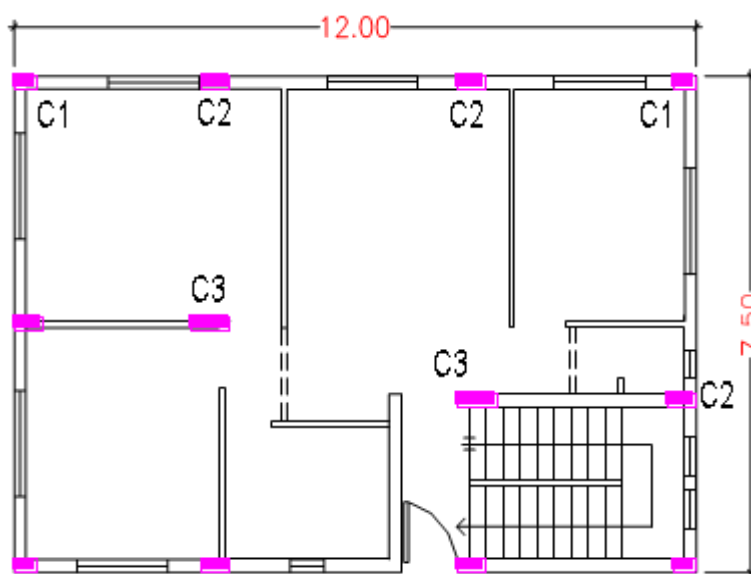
Floor plan and columns location for earthquake resistant building-1.
